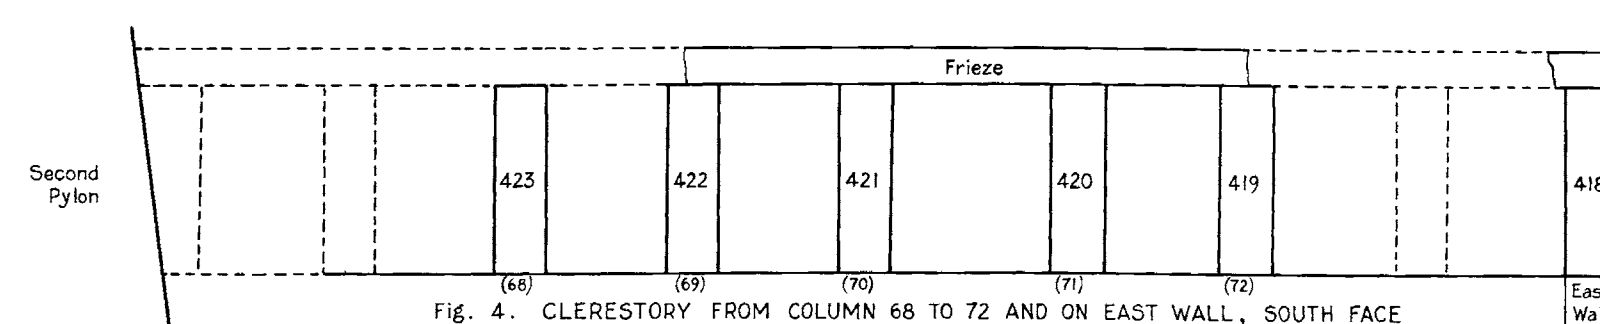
CLERESTORY FROM COLUMN 68 TO 72 AND ON EAST WALL, SOUTH FACE
